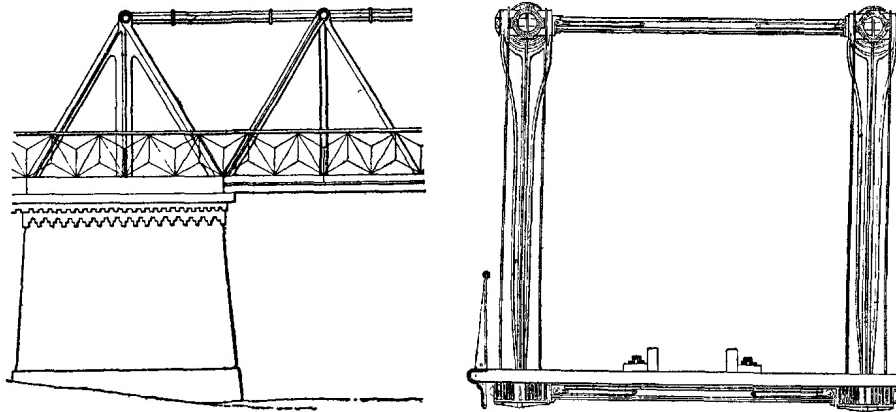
Newark Dyke Bridge and Section of Newark Dyke Bridge.
